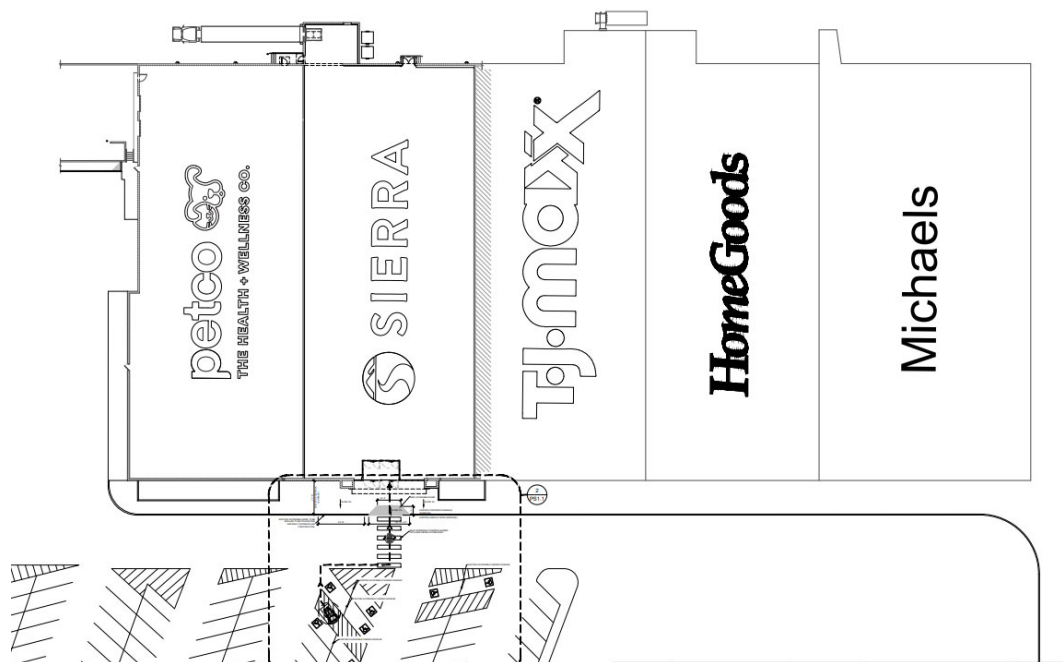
Excerpt of Orchard Corners shopping center with proposed tenants Sierra and Petco.
